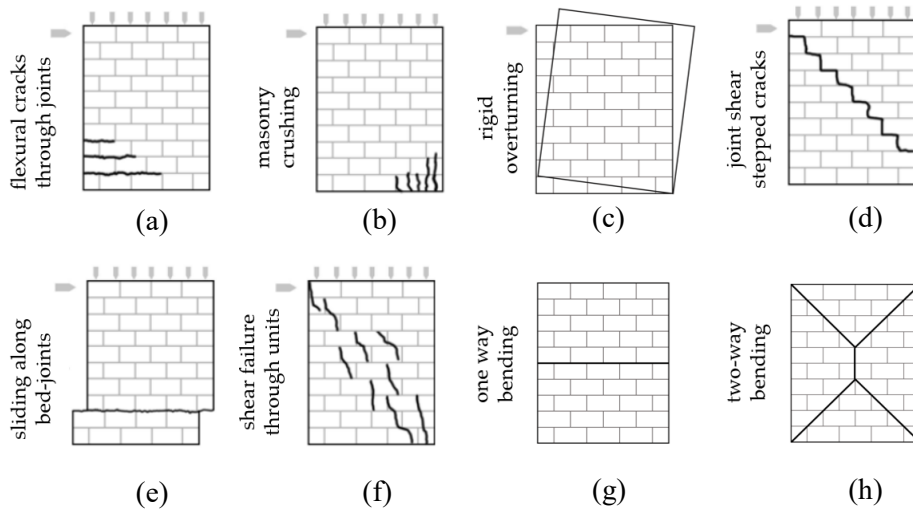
In-plane failure mode of a URM panel: a) flexural failure mode with cracks through bed joints, b) masonry crushing in compression, c) rigid overturning, d) diagonal shear failure with stepped cracks through joints, e) sliding along bed joints, and f) diagonal shear failure with cracks through bricks. (adapted from Malomo et al. (2018a)). Out of plane failure mode of a URM panel: g) one-way bending, and h) two-way bending.
